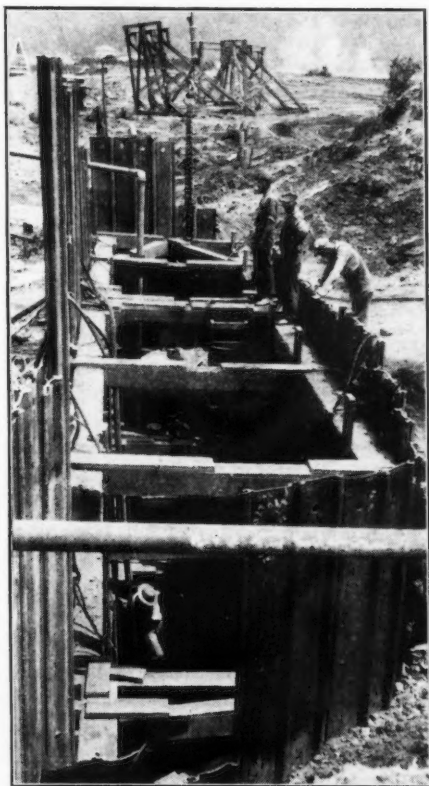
EXCAVATING THE TRENCH ALONG THE STEEL PILE CUTOFF TO CORRECT SEAMS AND SOLUTION CHANNELS BENEATH THE ROCK FLOOR
